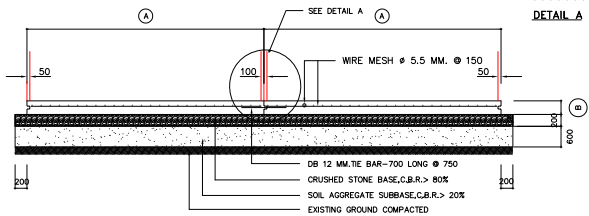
DETAIL OF ASPHALTIC CONCRETE PAVEMENT SECTION
